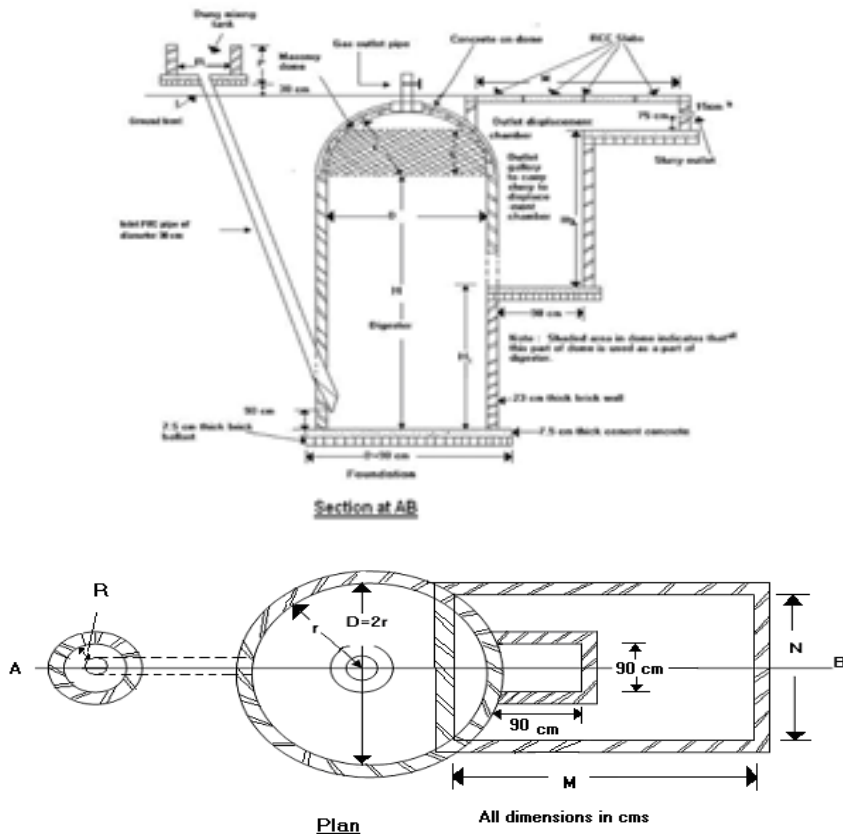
Dimensions of new modified PAU Janta model biogas plant
